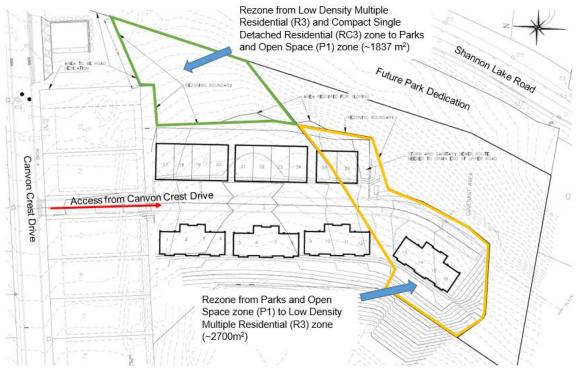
Proposed Zoning & Preliminary Subdivision Layout
